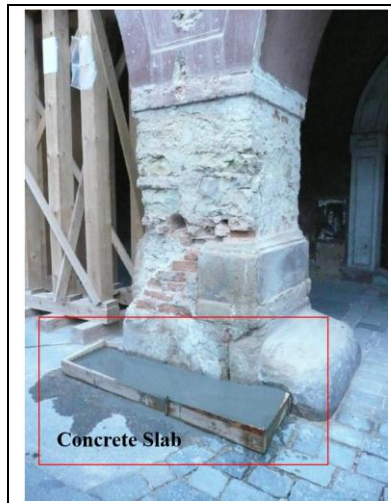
Concrete Slab Placement for Building in Pohorelec 112, Praha [19]
